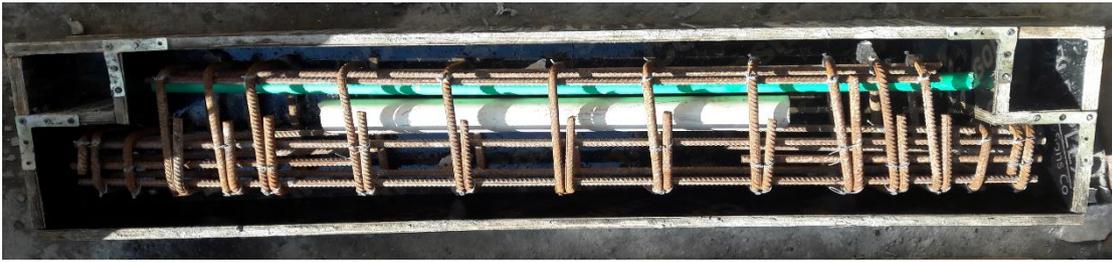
Reinforcement Details of R.C. Inverted Dapped Ends Girders Layout.
